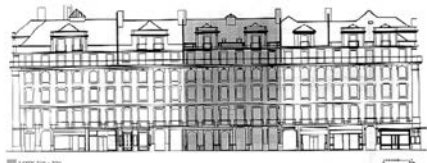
Plan of the facades of a typical block of buildings (Santos, 2000)
